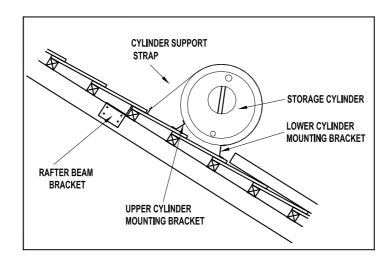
Cylinder Support Strap Location (Roof Pitch > 30 Degrees)
